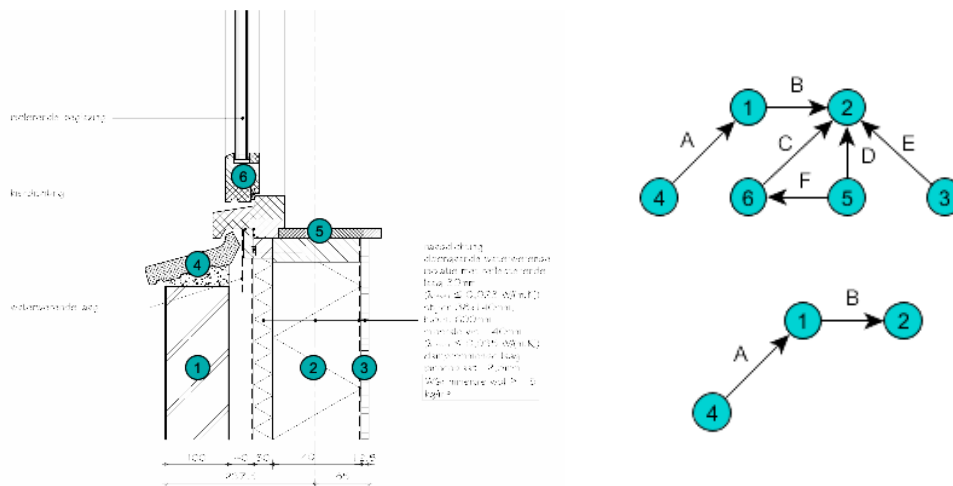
Example of assessing the Product Disassembly Potential and the Connection Disassembly potential (detail drawing, (SBRCURnet, 2015))
